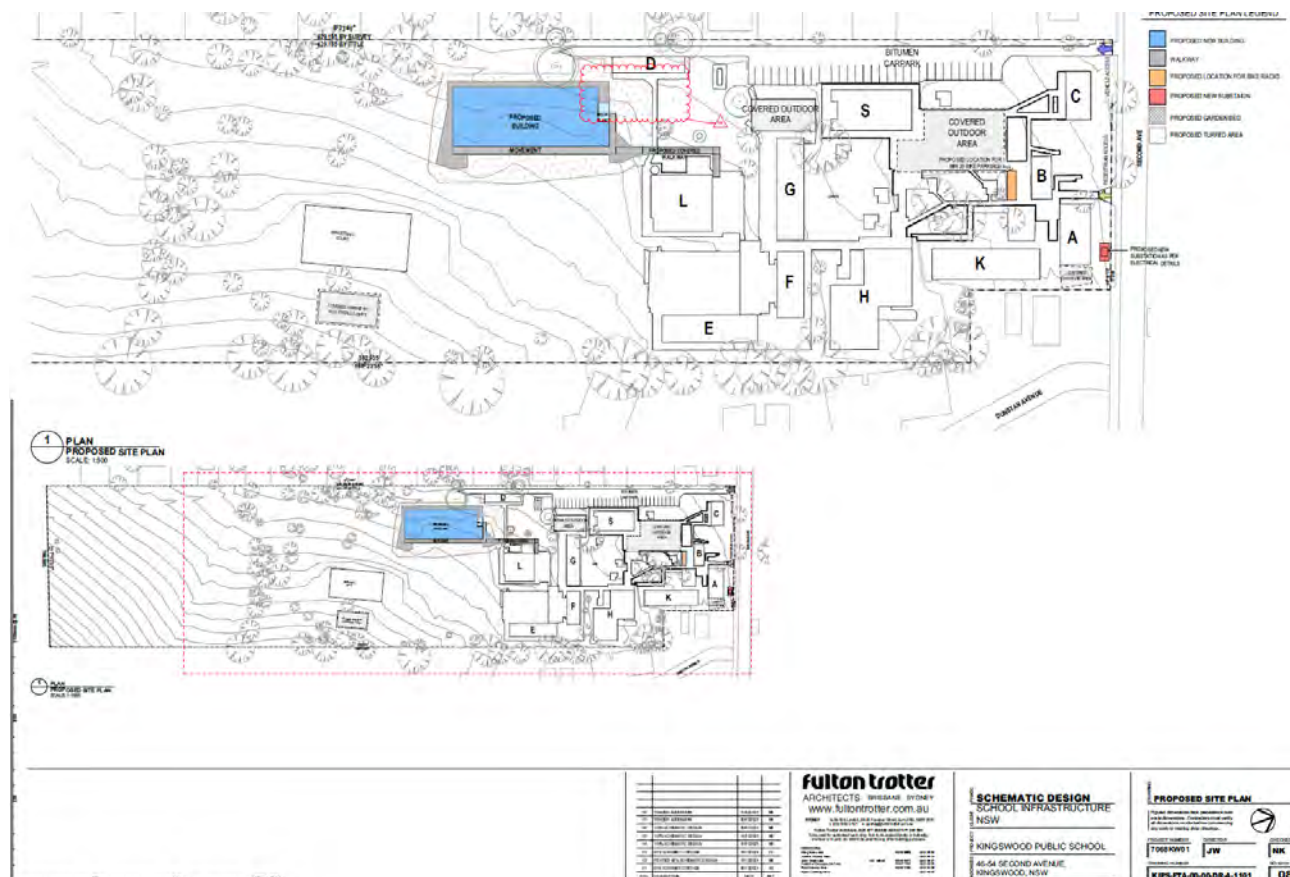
Excerpt from Proposed Site Plan (Dwg. No. KIPS-FTA-00-00-DR-A-1101, Rev. 8). Fulton Trotter, 21 February 2025.
